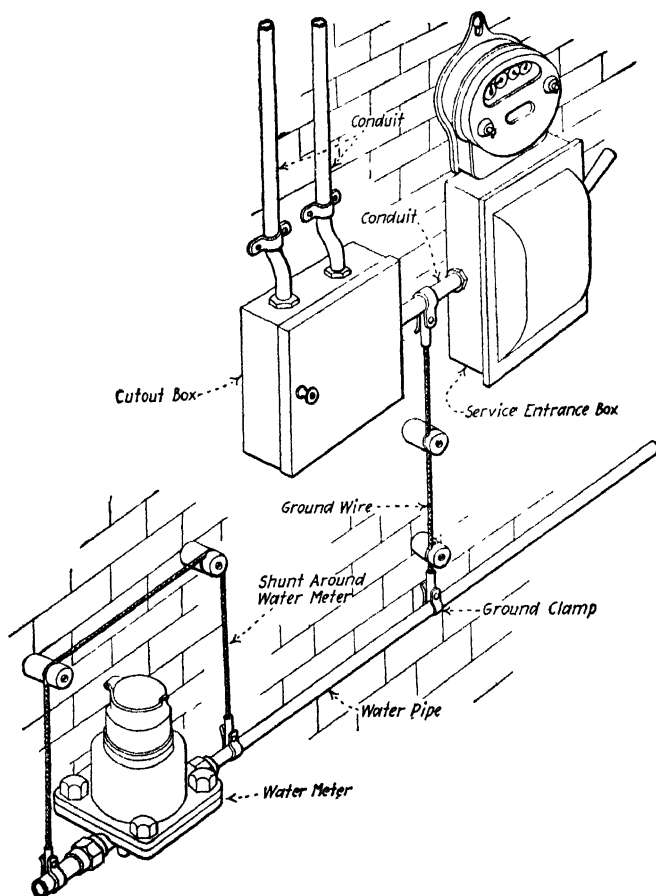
Method of grounding conduit system to water pipe on the inside of the water meter.
